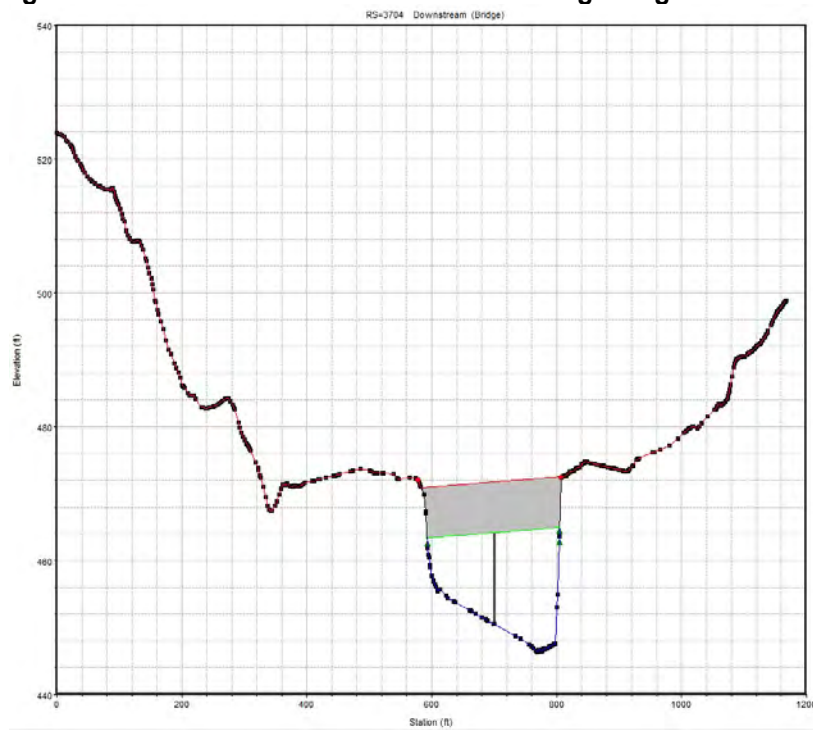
Cross-Section View of the Proposed Bridge in HEC-RAS
